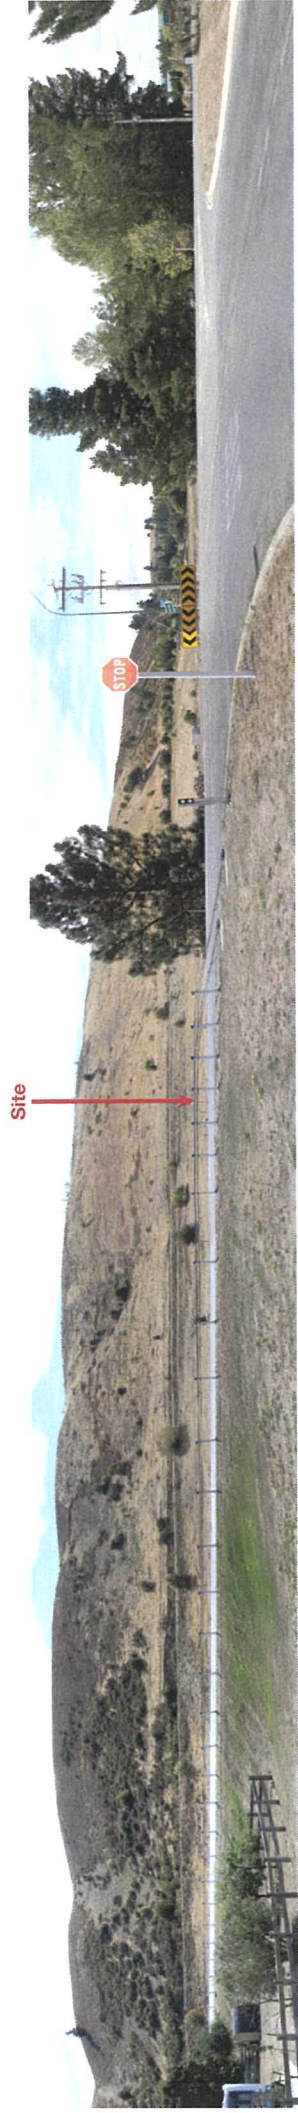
View eastward toward the site from Hazlett Street, close to its intersection with State Highway 8
